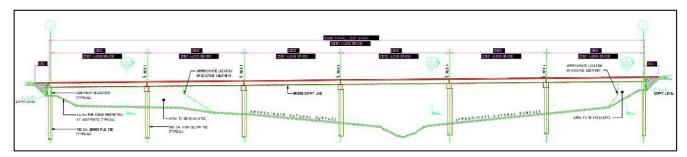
East West Connector Road crossing of South Creek, dashed green line indicating approximate location of existing abutment
